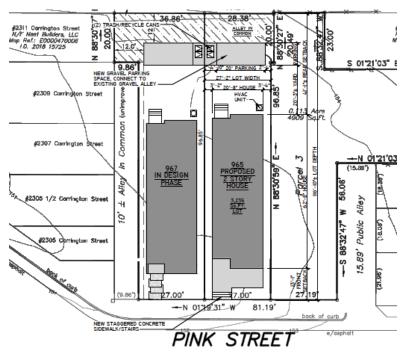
Plan of proposed parcel layout and proposed dwelling along Pink Street
